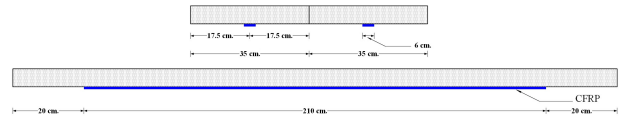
Schematic representation of specimen strengthening with CFRP sheets showing longitudinal profile and reinforcement details.
